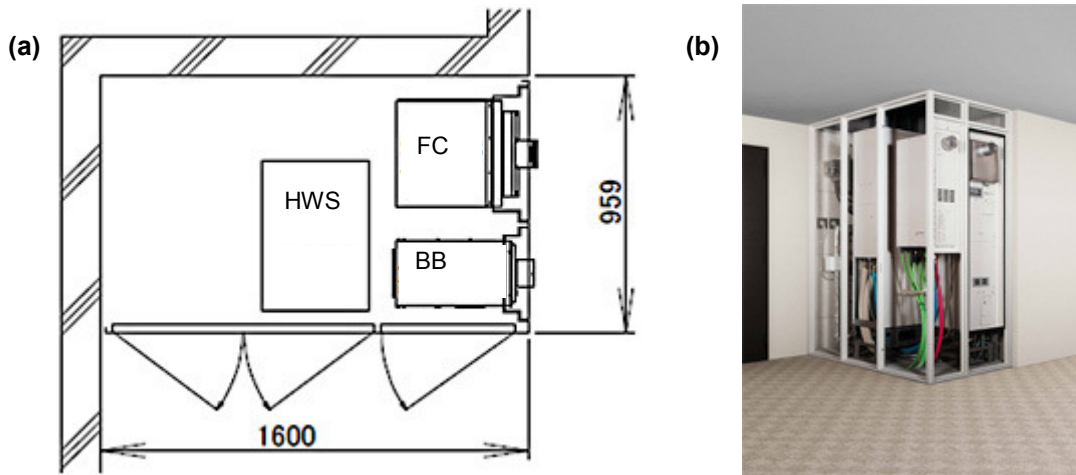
An Example of (a) installation layout and (b) an external view of ENE-FARM installed in a pipe shaft
